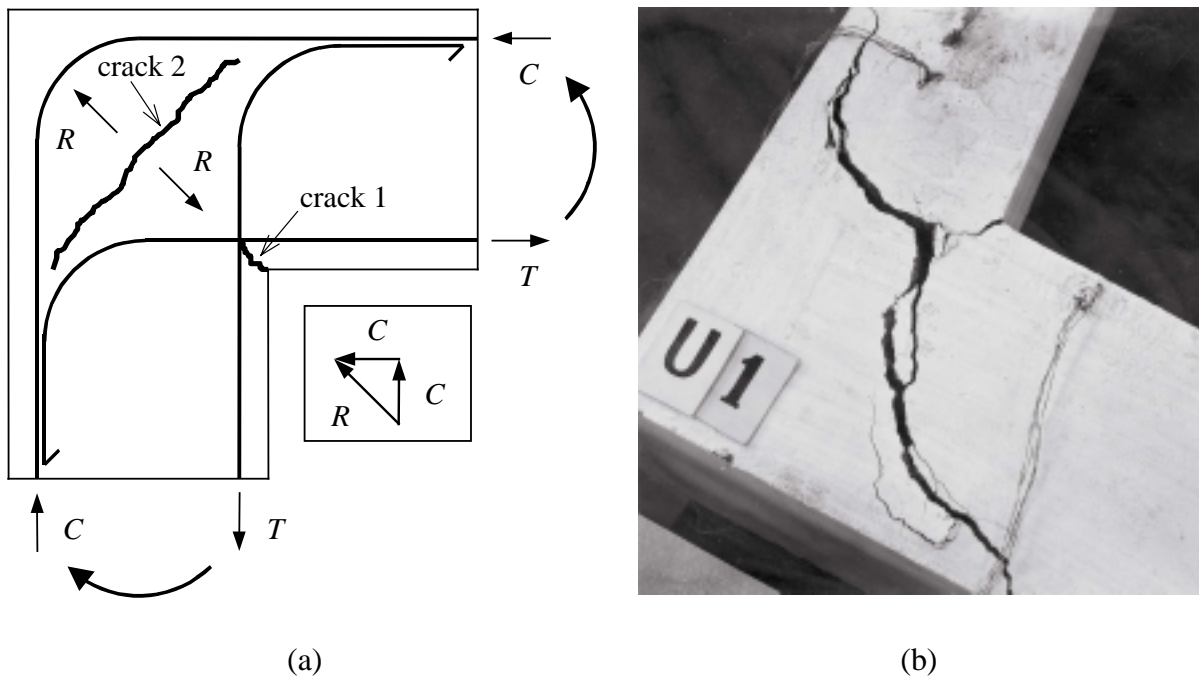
(a) Reinforcement detailing in earlier practice (*Type 1*) which is not very successful; (b) typical crack pattern at failure when such a detailing is used (no compressive reinforcement included here, though). From Nilsson (1973).
